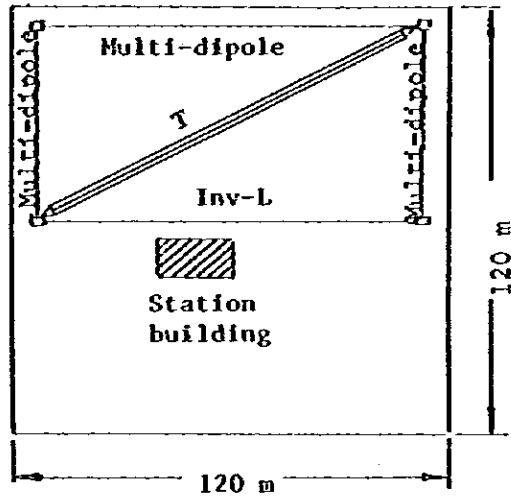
(1) Typical Site Layout for Class A Station
